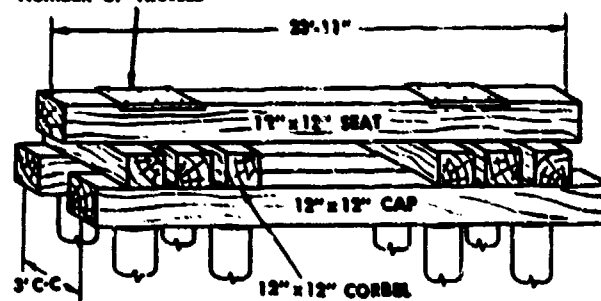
Construction of pile caps for intermediate supports under panel bridges without end posts or bearings. Cap for double trestle or pile bent.
